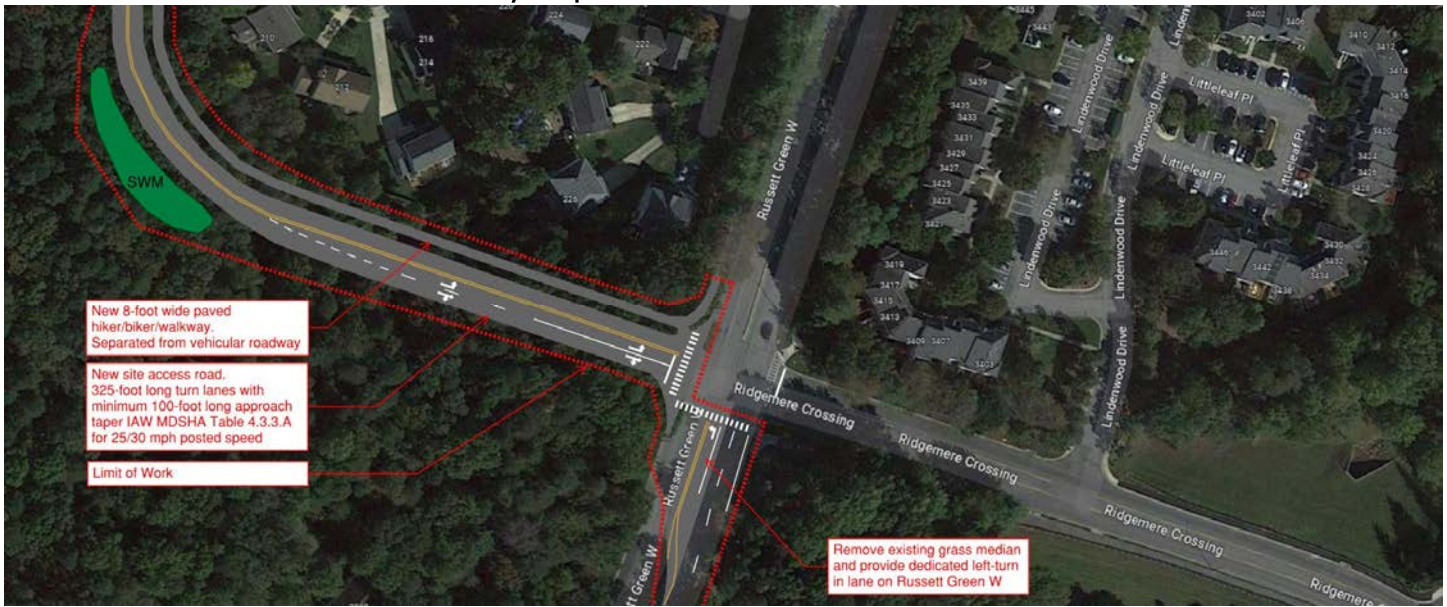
' - Probable Improvements to Russett Green West, Ridgemere Crossing – Site #3
